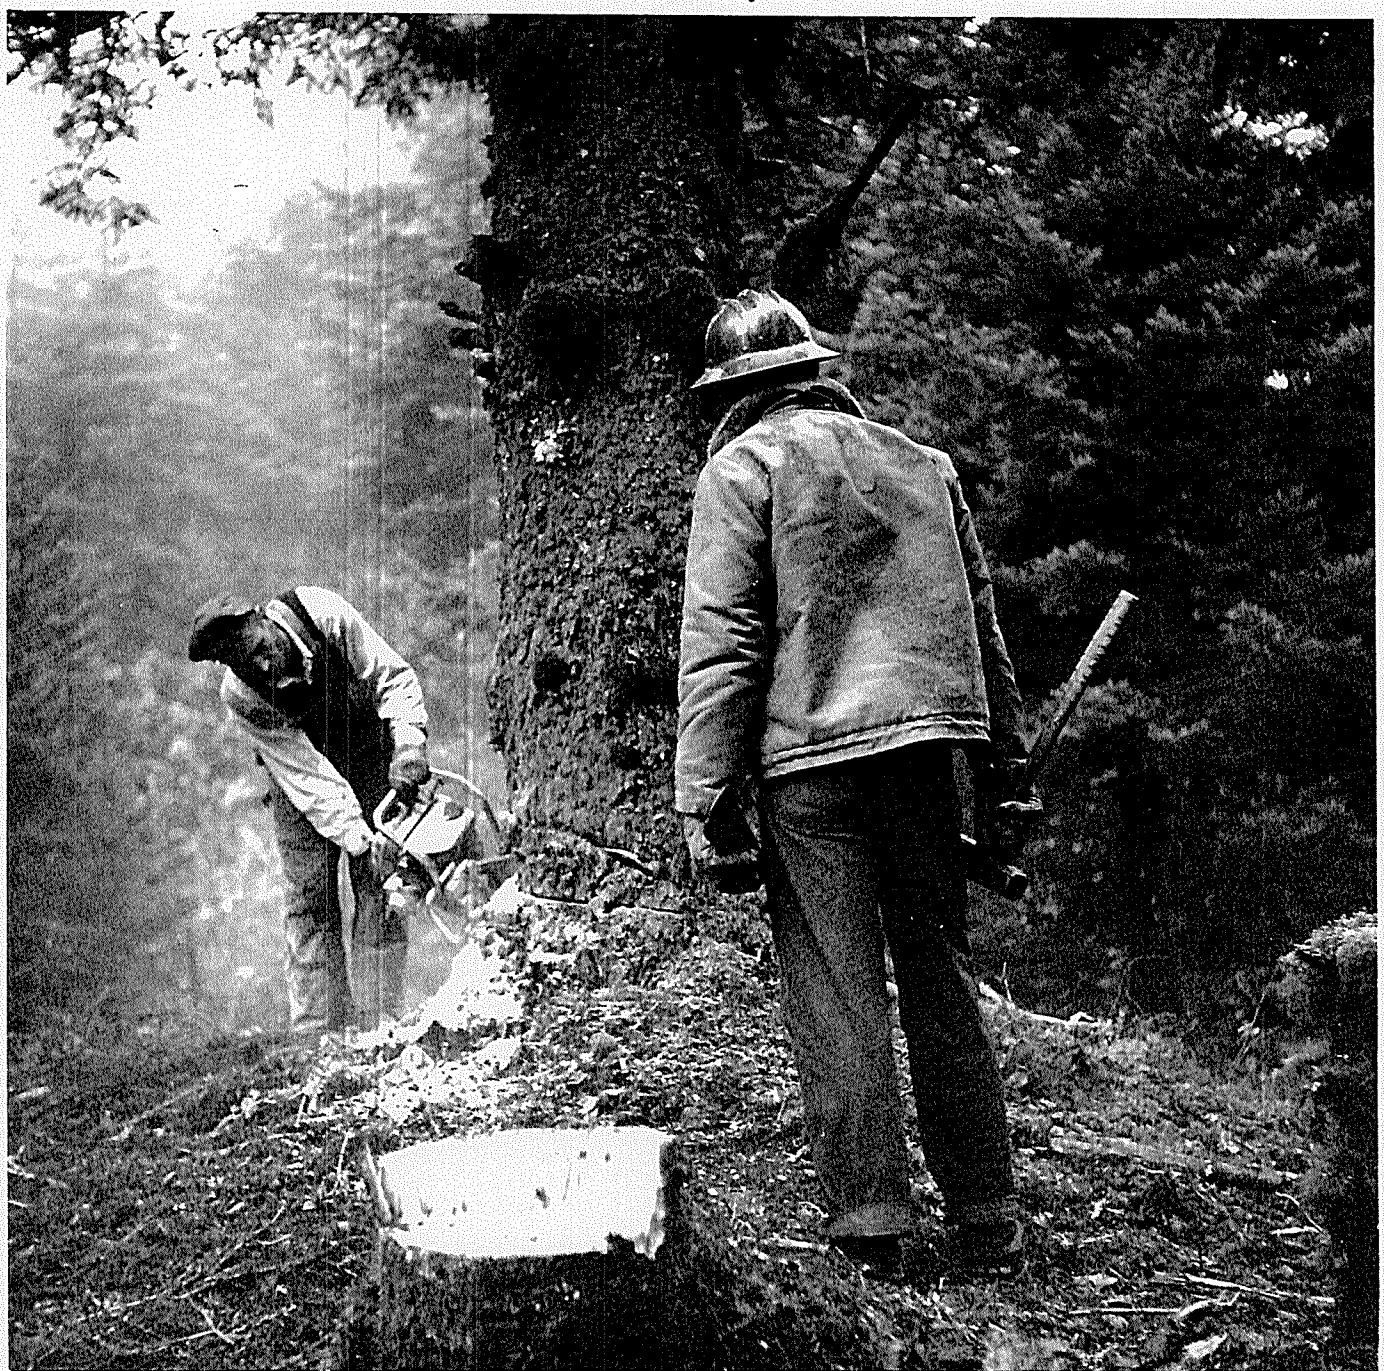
D Redink - heavy clearing and grubbing necessary.
